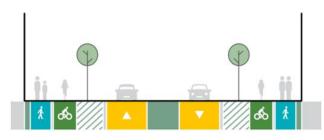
CFAF Outcome - Pine Valley Road indicative 24 m cross section
